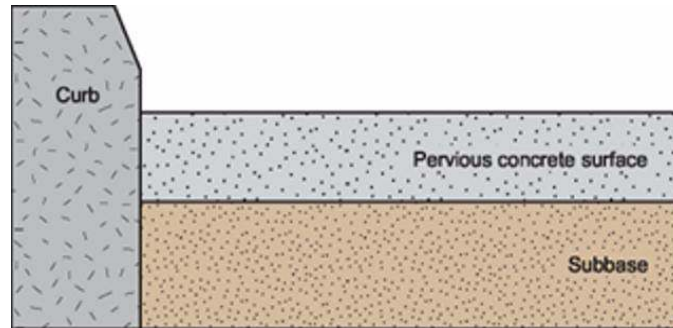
Section of a Typical Pervious Concrete Pavement
